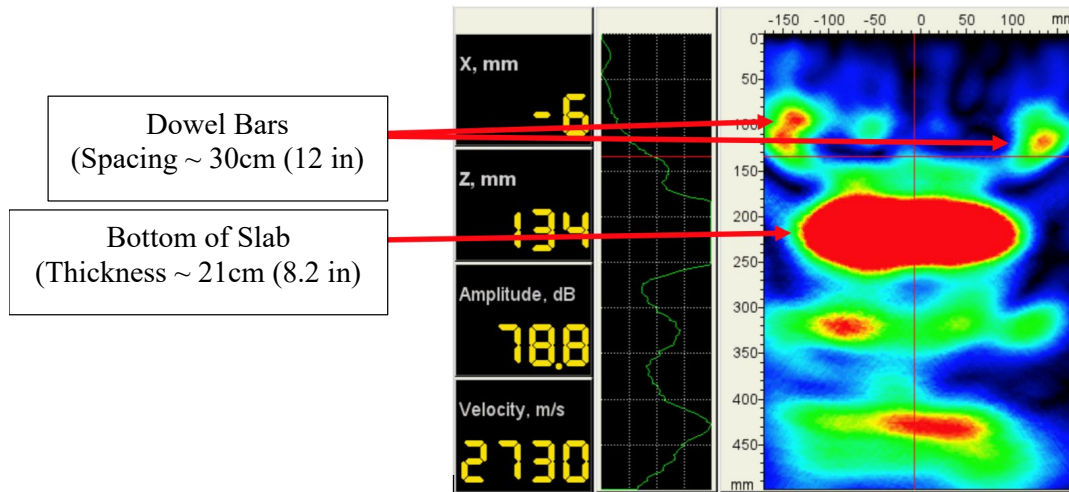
Photo. Ultrasonic tomographic image from example concrete pavement section.
